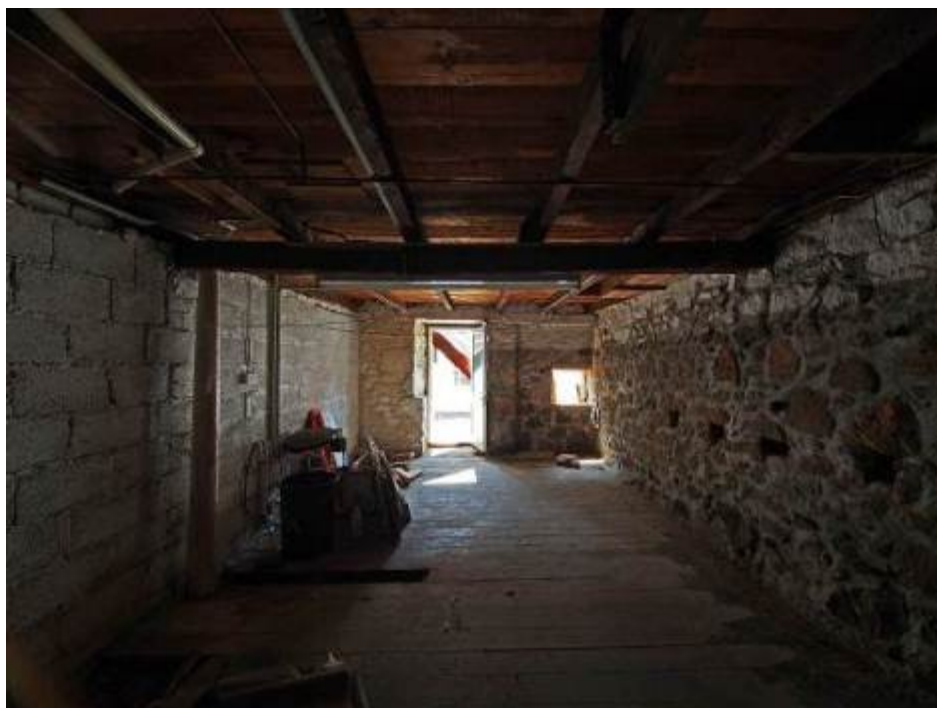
Cellar, looking S to St Eia St entrance; note pilchard pressing pole slots in right hand wall, re-used ships spar supporting large cross beam
